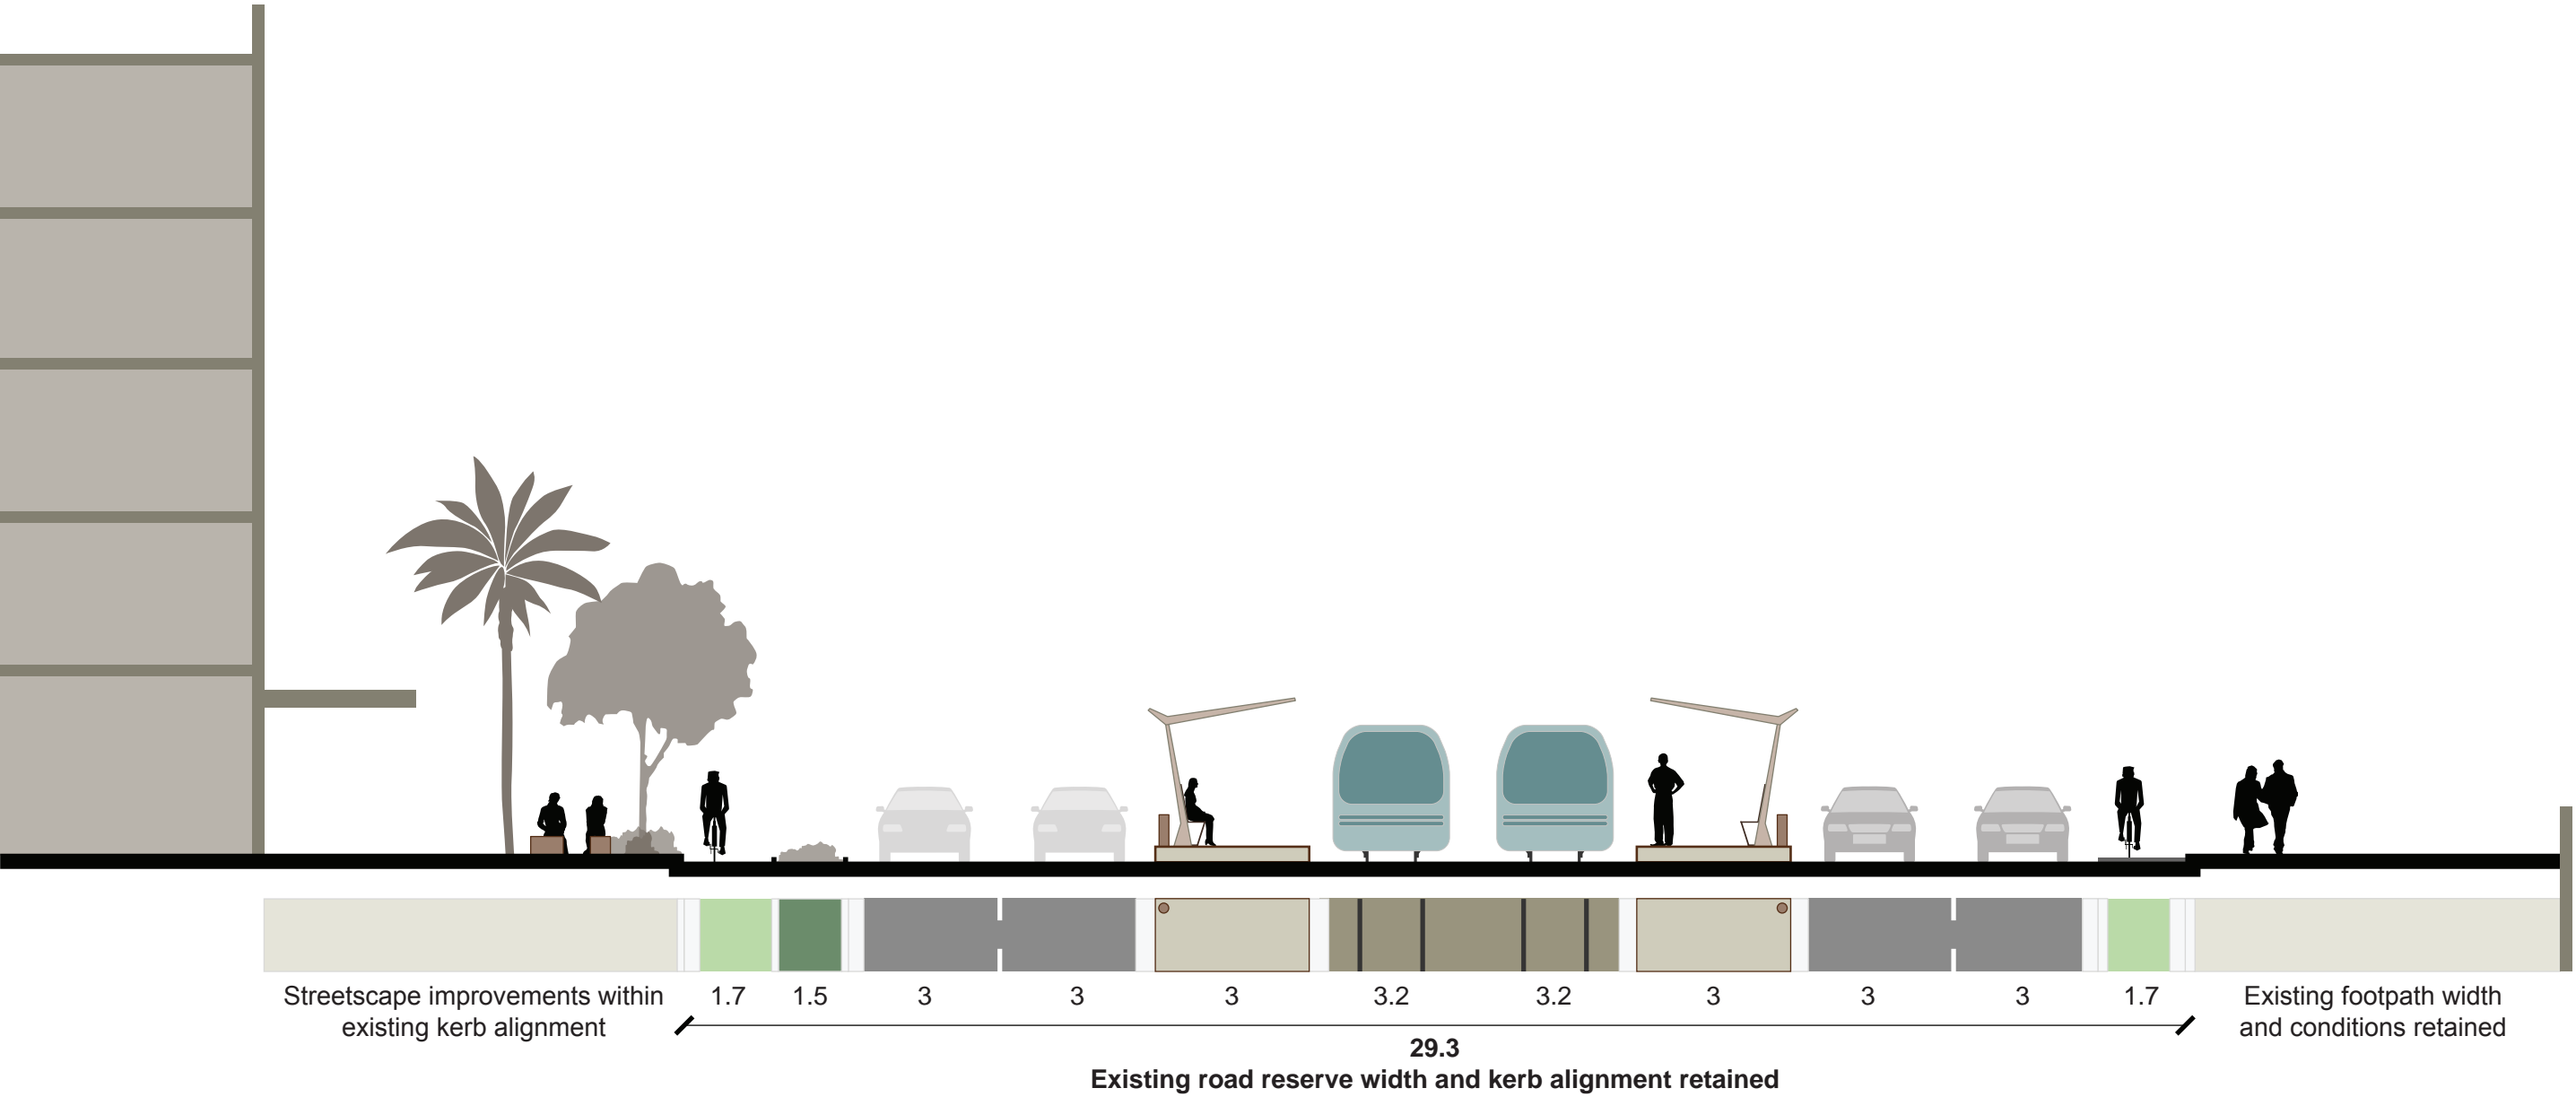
Beach Road Stop (The Pavillion): Indicative Cross Section A
